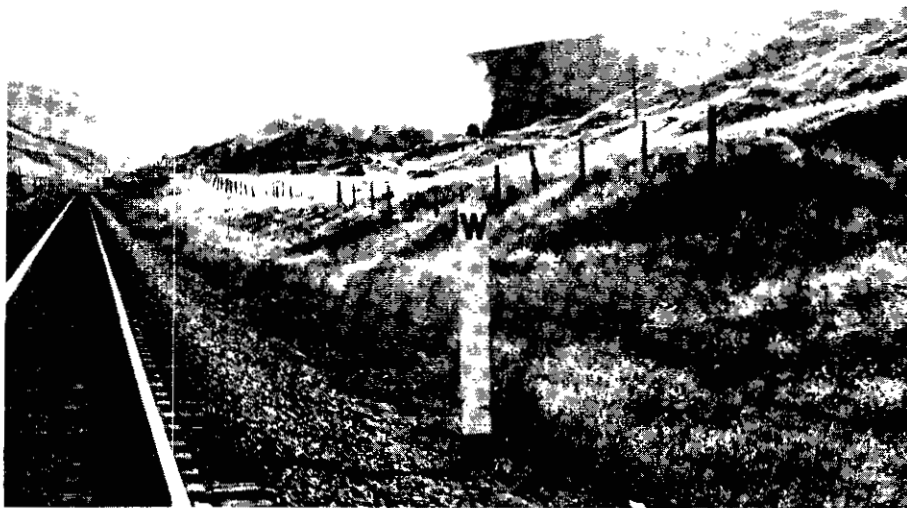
View Westward at Proposed Point of Switch, J&T Lumber Site
